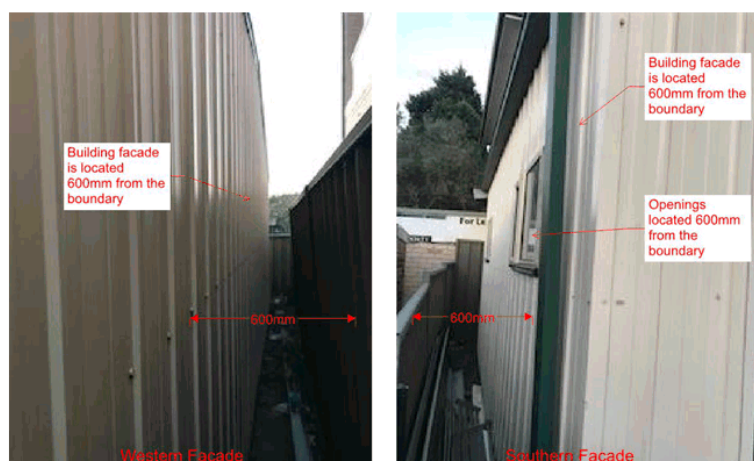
Photos of the External Walls and Window Openings within 900mm from the Boundary
